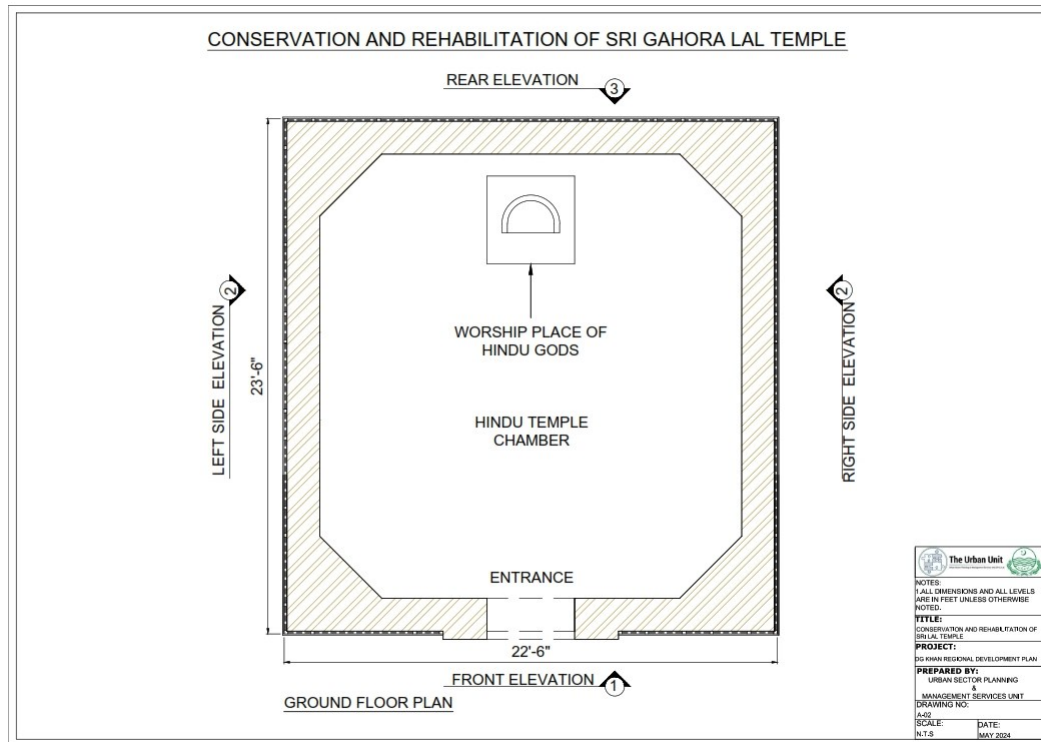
Conceptual Design of Ground Floor Plan of Sri Gahora Lal Temple
